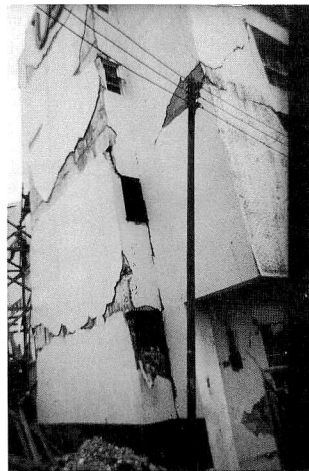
(d) University of BUGUIO College of Commerce North side view.
